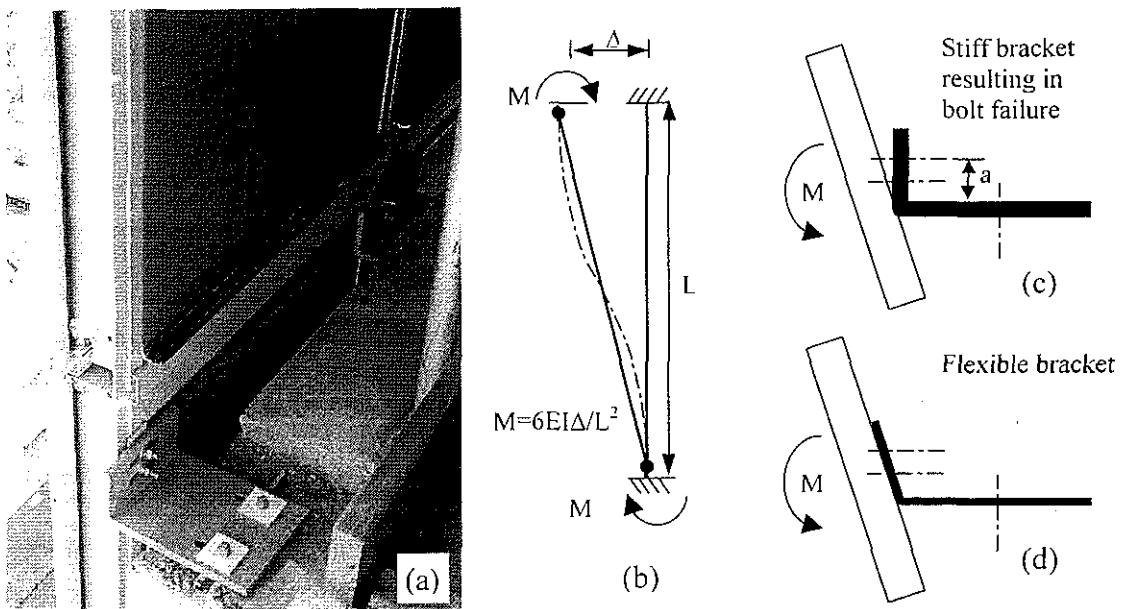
Connections between glazing panels and structure: (a) a photo of a typical bracket support; (b) possible idealisation of panel deformation; (c) bolt failure; and (d) distortion of bracket.
